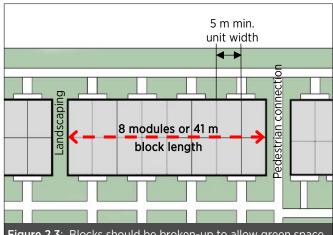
Blocks should be broken-up to allow green space and pedestrian connections
